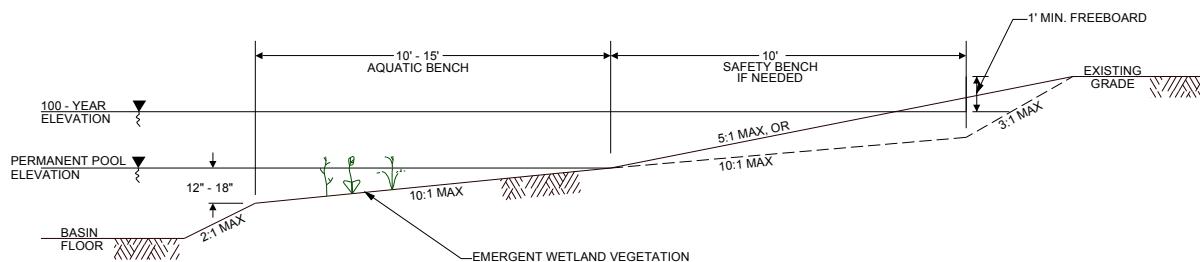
Typical Stormwater Pond Geometry Criteria
